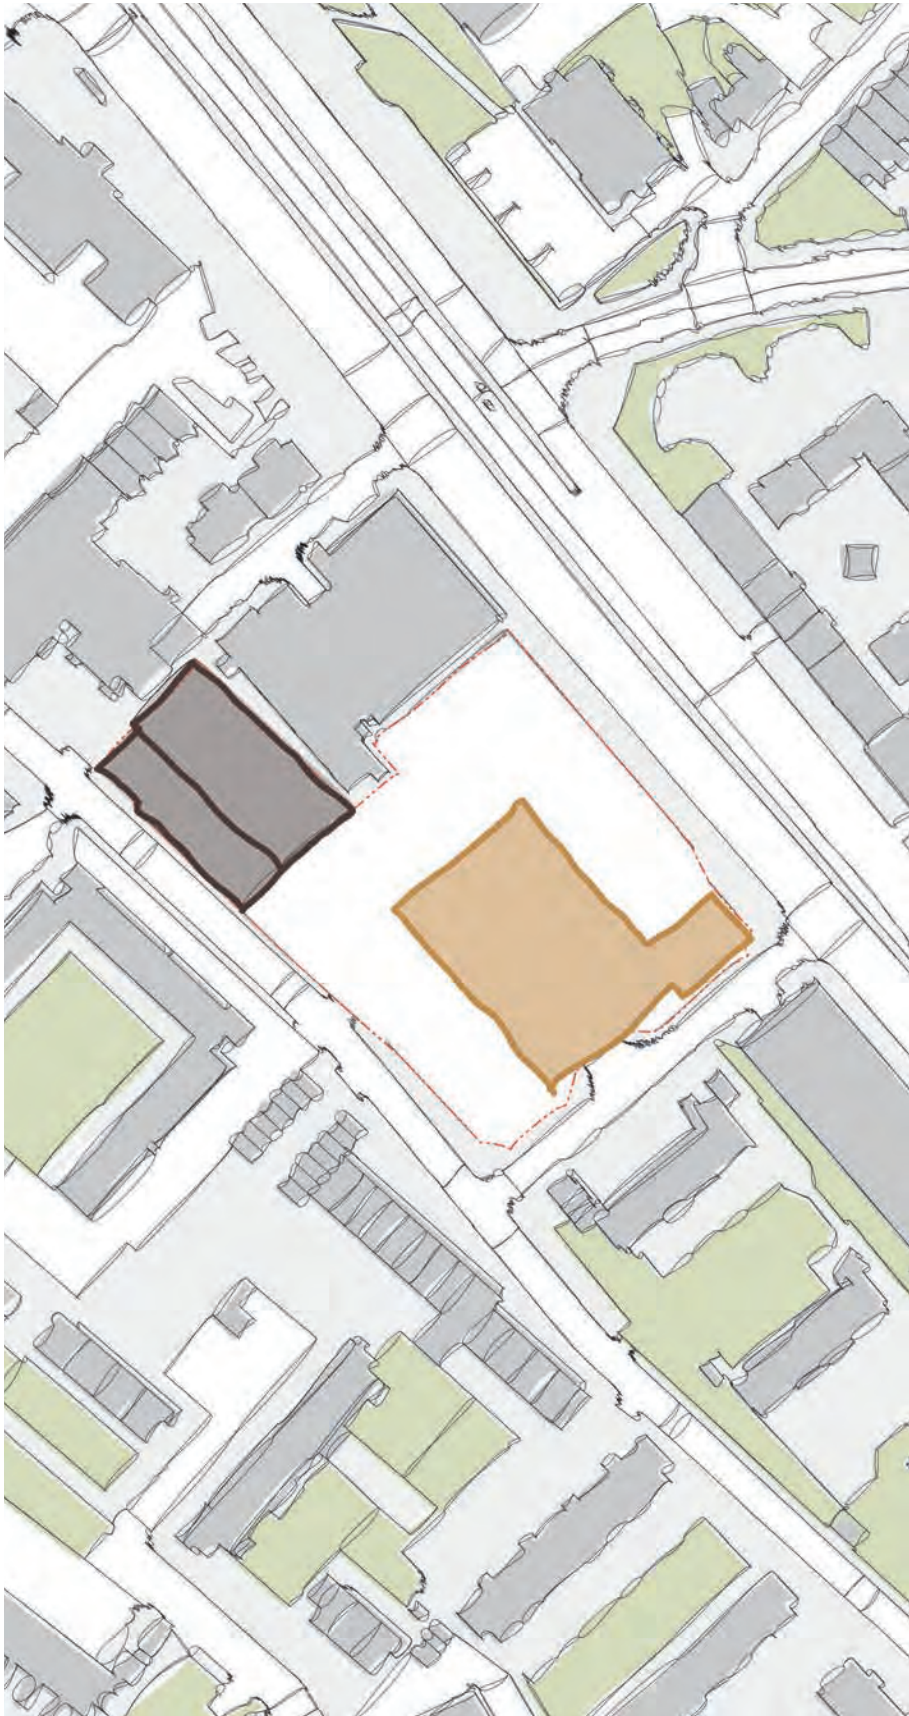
Relocate Lidl store to the centre of the site. Activate Massinger Street frontage
